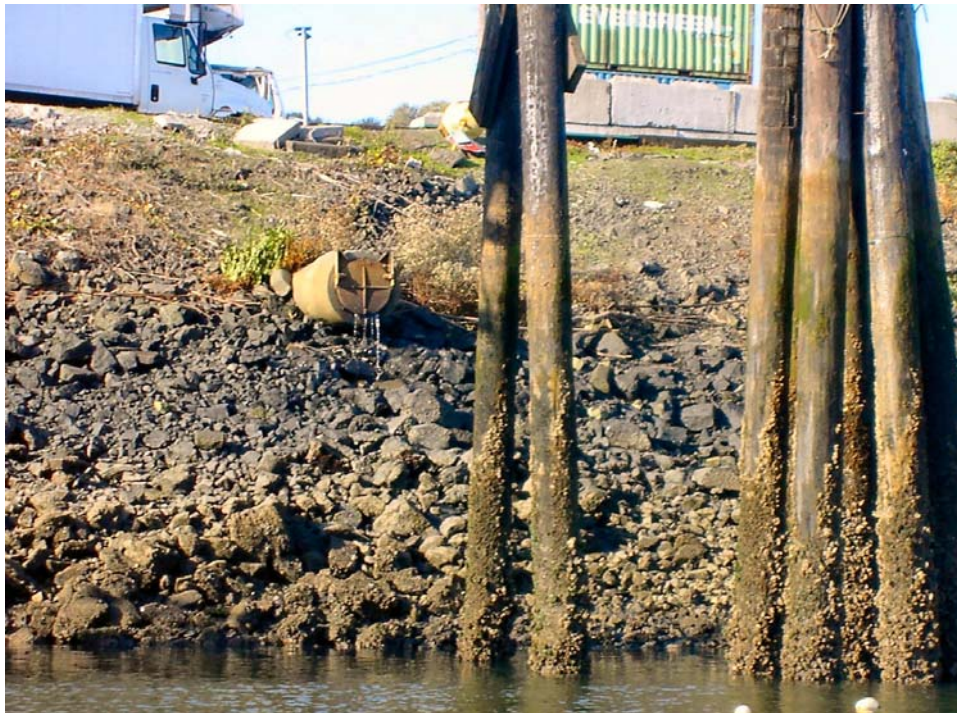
Looking west at outfall T115_001, a 24" concrete pipe.
